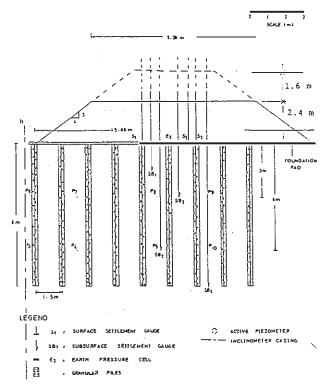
Cross-section of test embankment with granular piles and location of field instruments.
